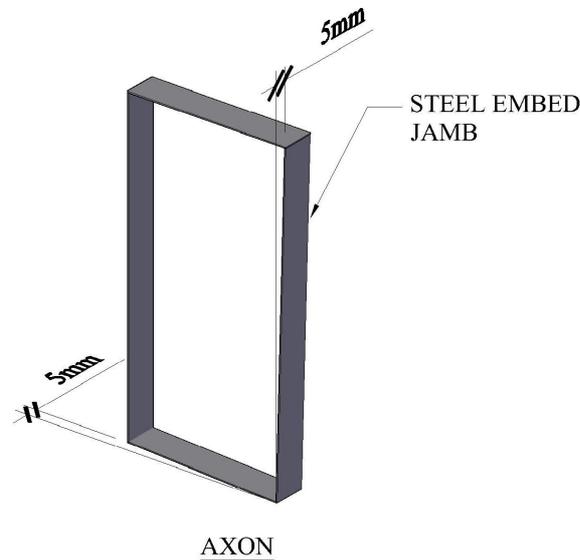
BI-AXIAL TOLERANCES
